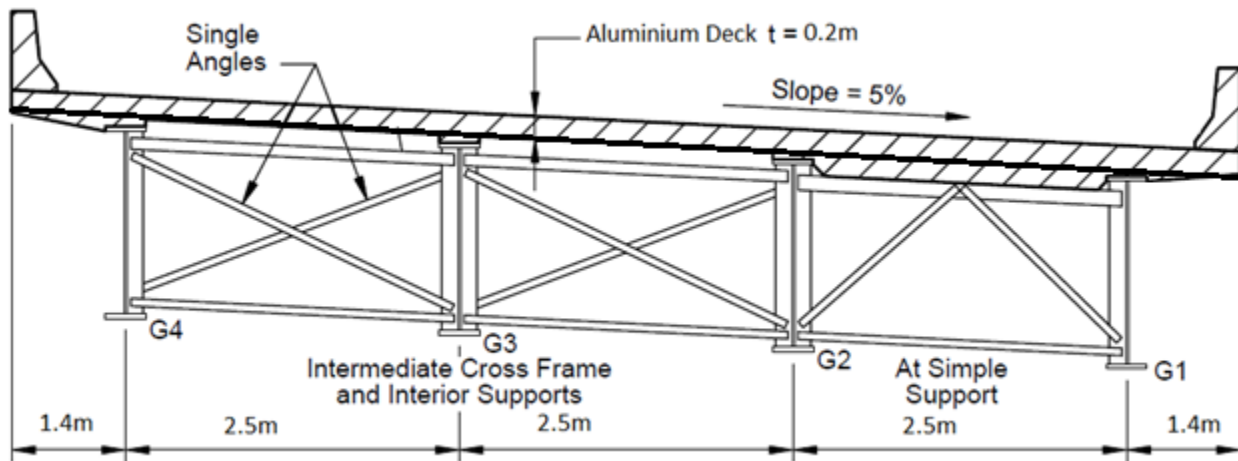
I girder bridge cross section showing cross frames. Source: Kulicki et al. (2005)
